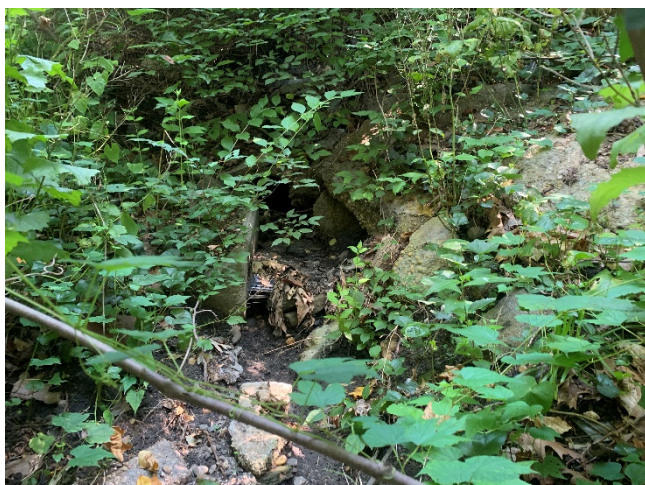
Structure #979: Partially obstructed by concrete and debris
